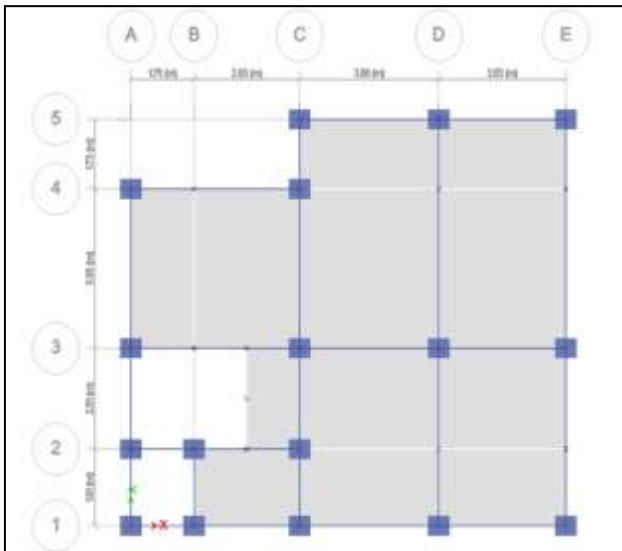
model (1) Plan view of G+20 Residential building model without shear wall
